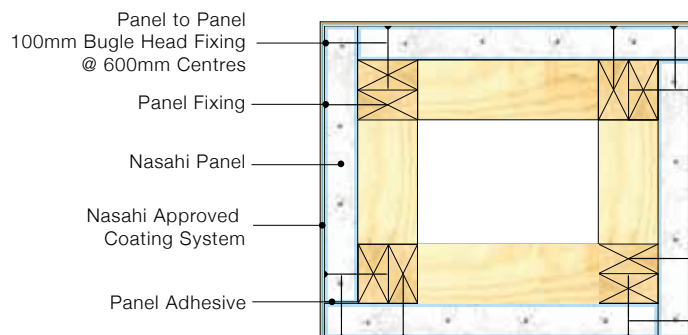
Inter Floor Junction (Panel Joint in Joist Zone)
